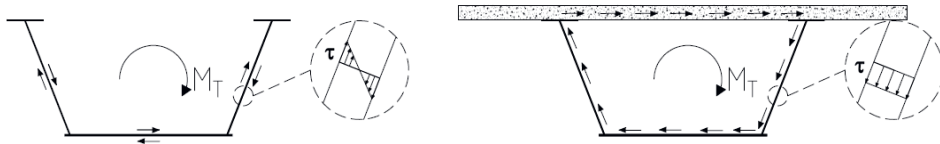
Shear stress from St. Venant torsion in an open- and closed cross section.
